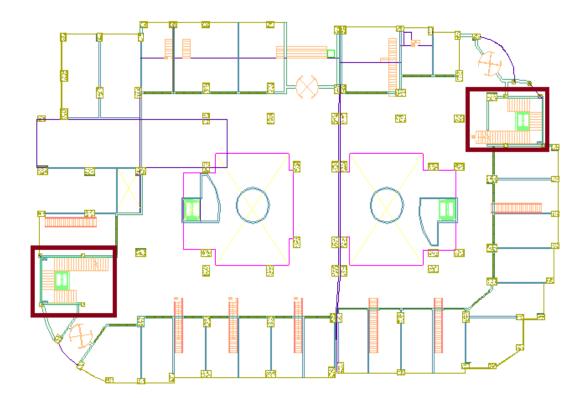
AutoCAD drawing for distribution of stairs in Ground floor
